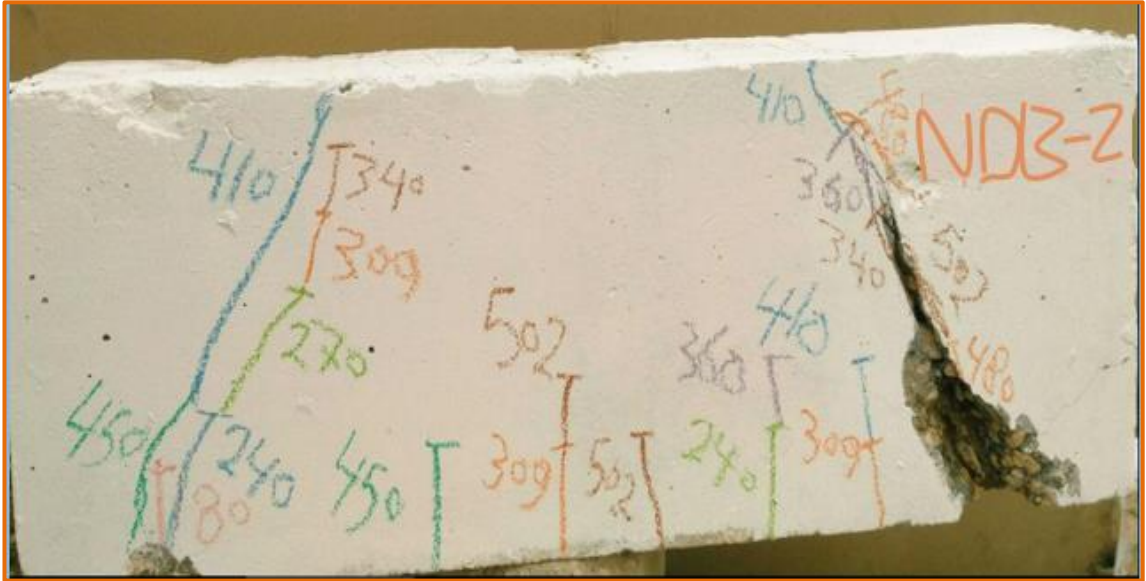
Crack pattern of beam NDB-2 at failure.
